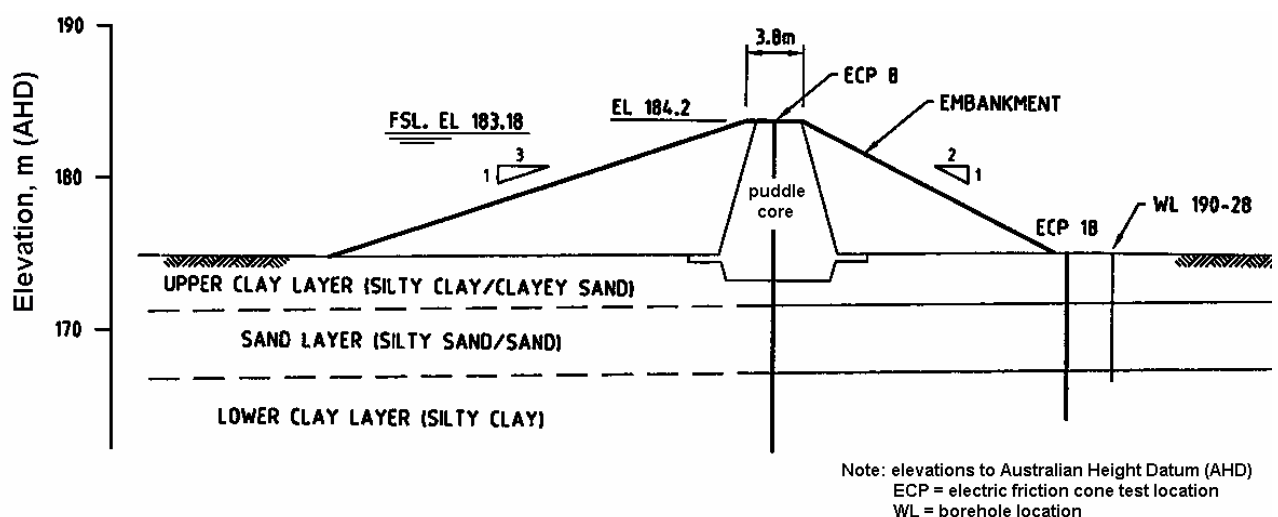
Cross section Yan Yean dam (courtesy of Melbourne Water)
